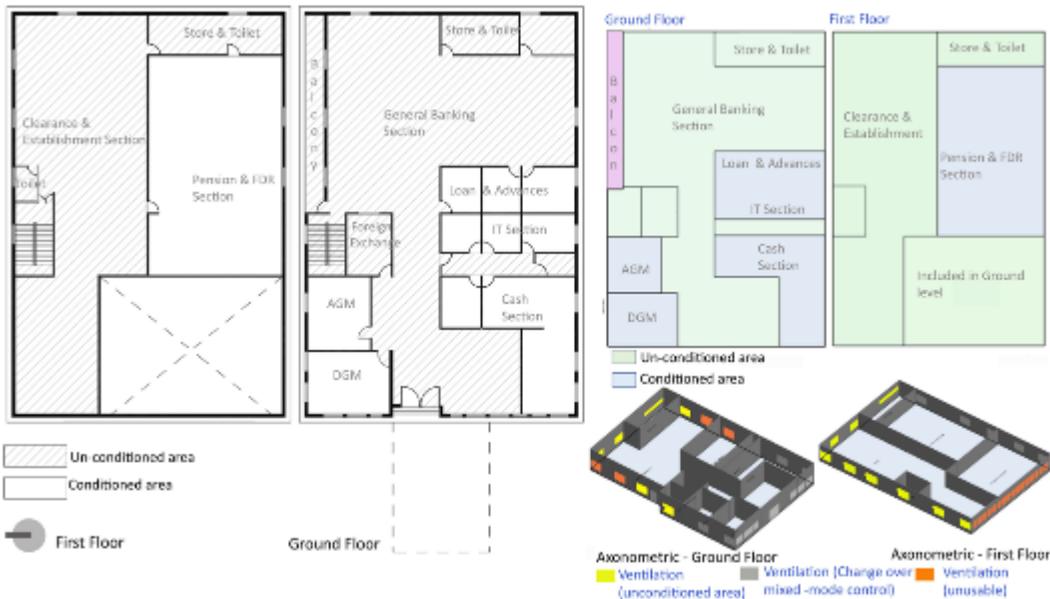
Floor Plans of Sonali Bank Building(left) & layout of plan defined by zone for Design Builder Simulation (right)
